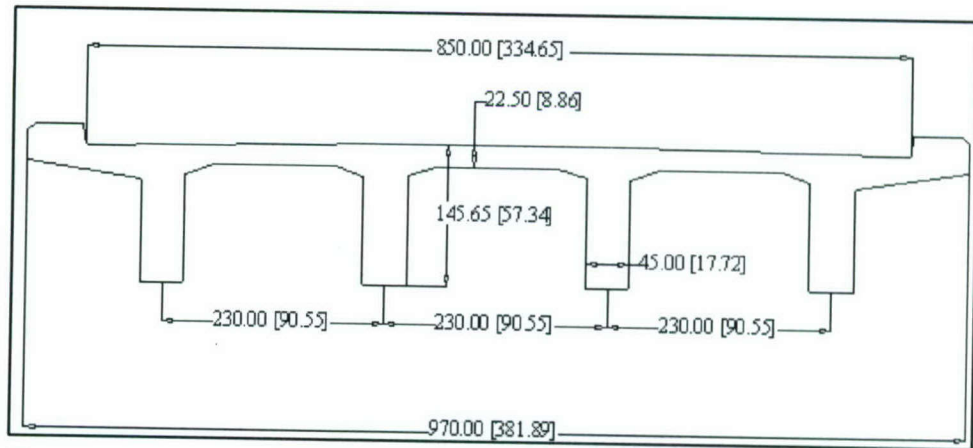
Cross-section of the bridge (GDH 1969) (centimeters [inches])
